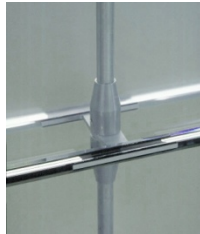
, b, c: details showing the center rods, glass connections, laminated panels and base beam.
